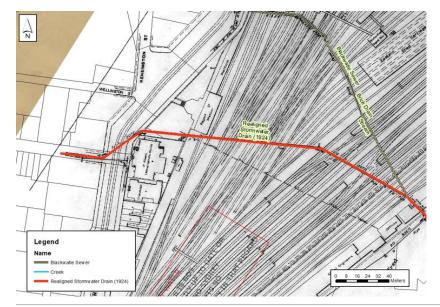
Location of the Old and New Drains, Source: "Detailed Sheet 3847." In City of Sydney, Metropolitan Water Sewerage and Drainage Board, 1950.
